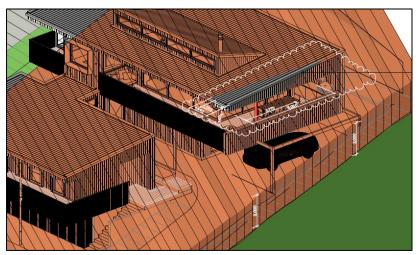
Elevation plan showing extent of HIRB infringement (Arkhe)
